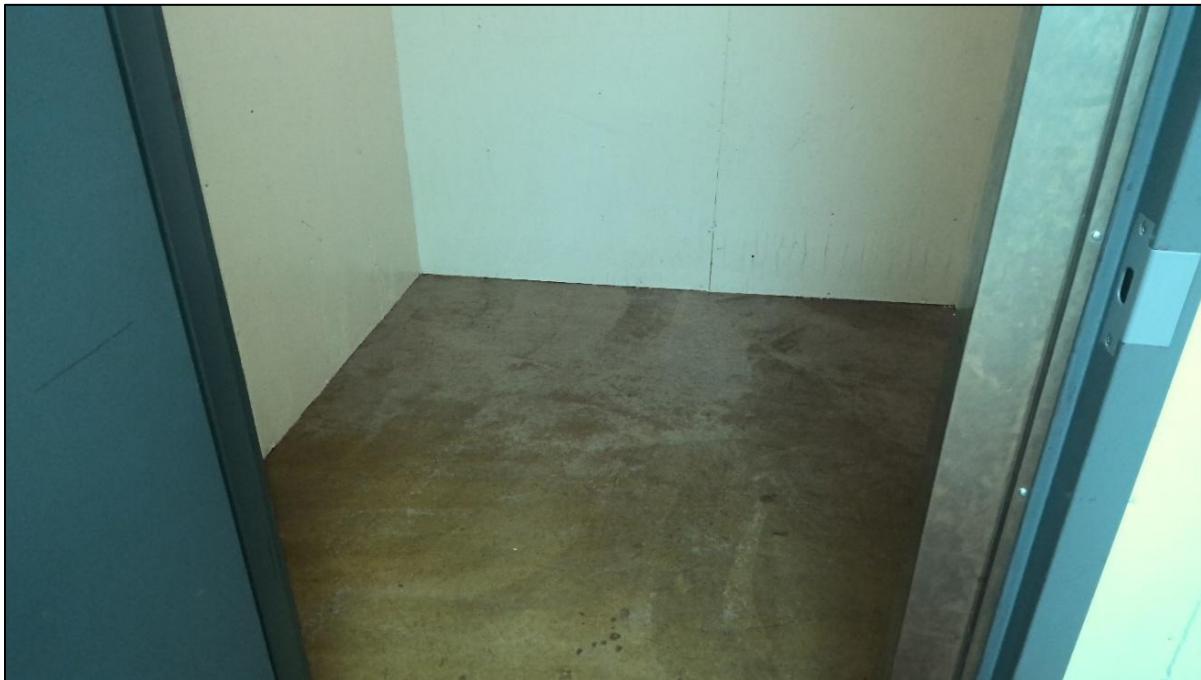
Looking into a seclusion room with the door open, an unclean concrete floor with dust or dirt and what appears to be water damage along the lower six inches of the walls around the seclusion room. The long silver strip on the right side of the door is the magnetic (keyless) locking mechanism. Washington Elementary School – Rochester, MN
